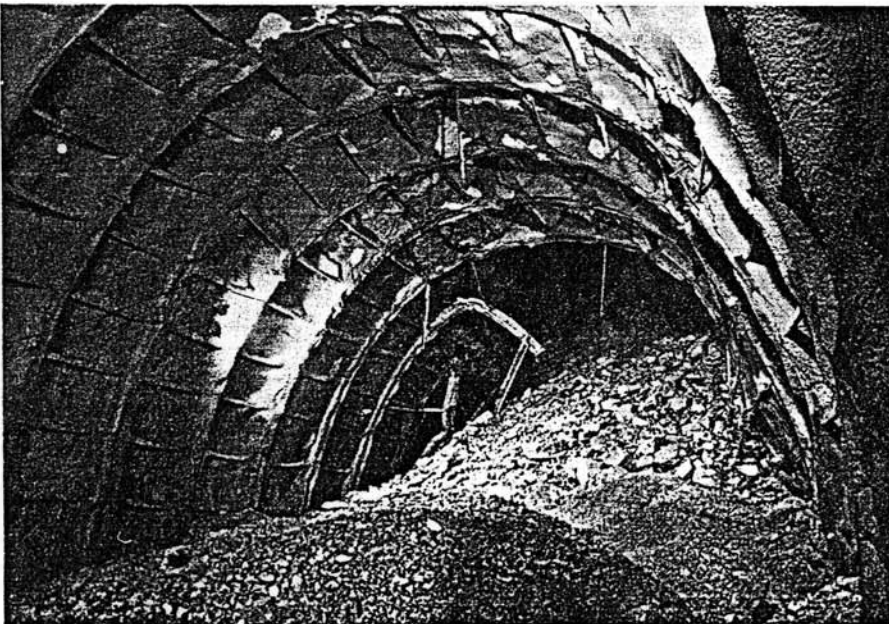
Condition of the two walls at the burst area: — right wall: collapsed and bulged; — left wall: practically undisturbed
